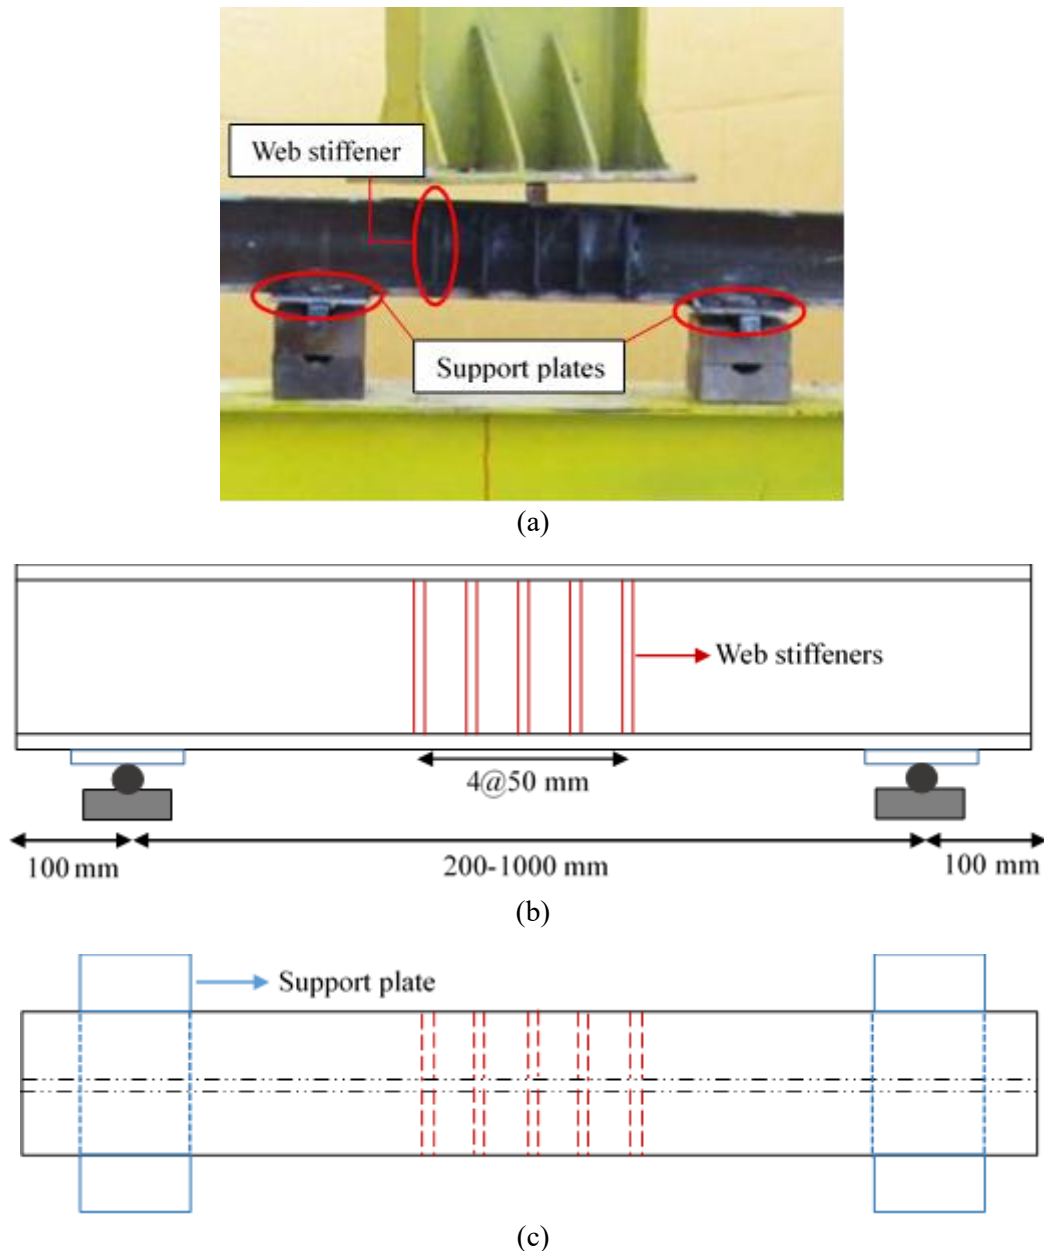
(a) Support plates and web stiffeners used in the tests. (b) Side view of steel beams. (c) top view of steel beams.
